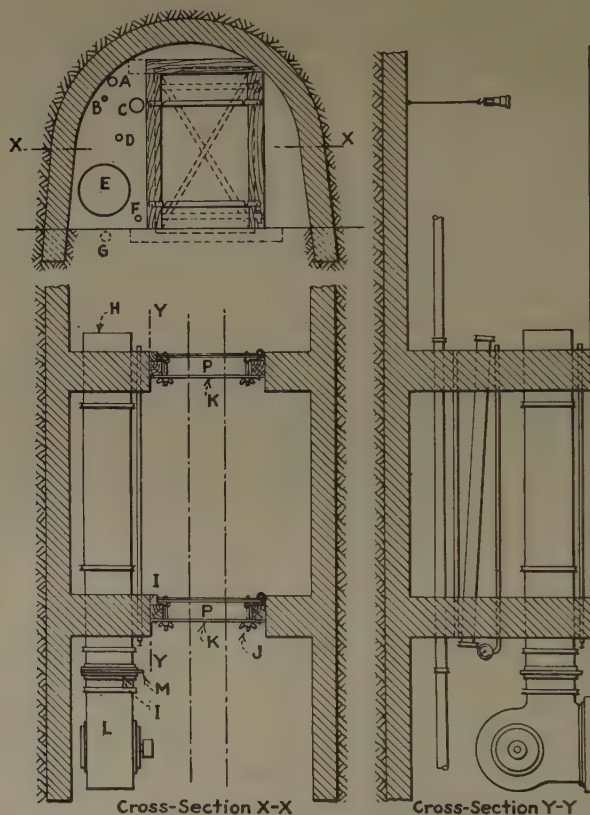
PLAN AND CROSS-SECTIONS OF AIR LOCK.
